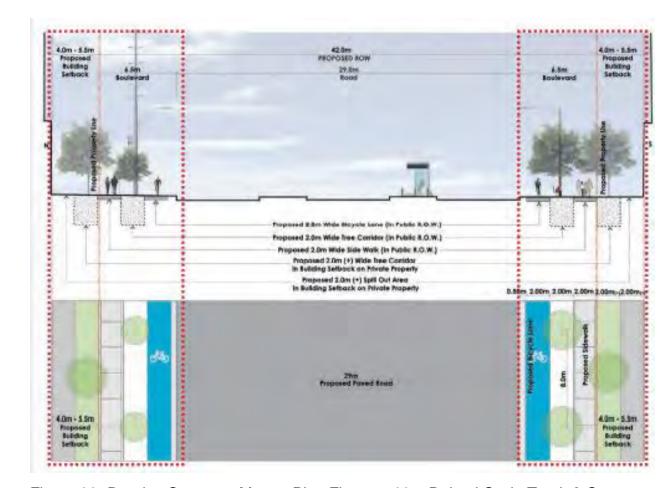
Dundas Connects Master Plan Figure 5-63 – Raised Cycle Track & Street Trees
